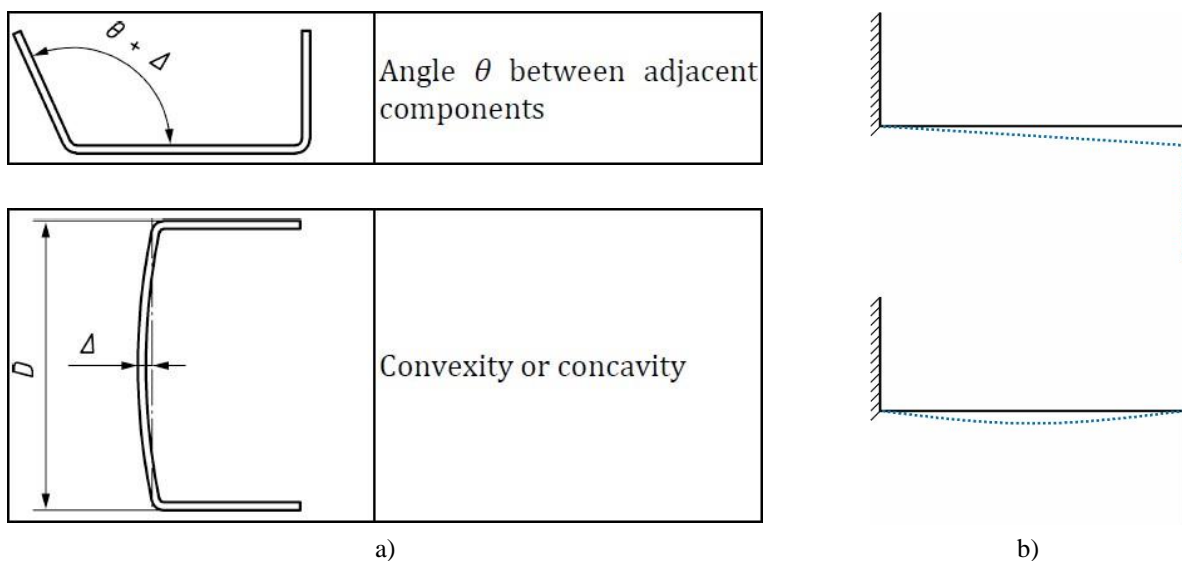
a) Manufacturing tolerances (3) and b) Resulting imperfections
